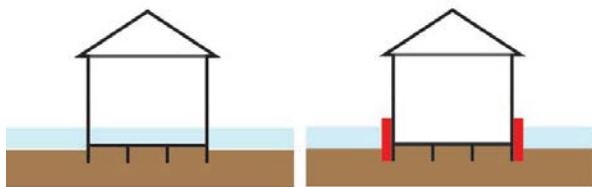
Dry Floodproofing Existing Construction* (NYC Department of Planning 2013a)
